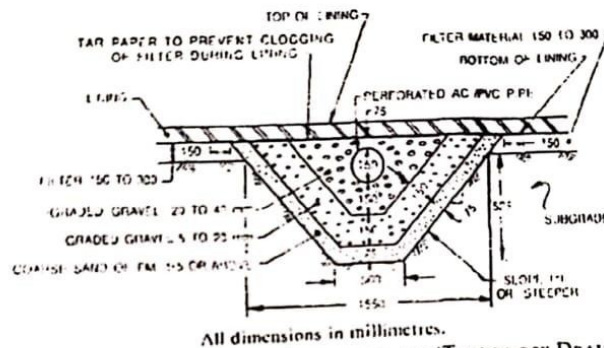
TYPICAL SECTION OF LONGITUDINAL/TRANSVERSE DRAIN
